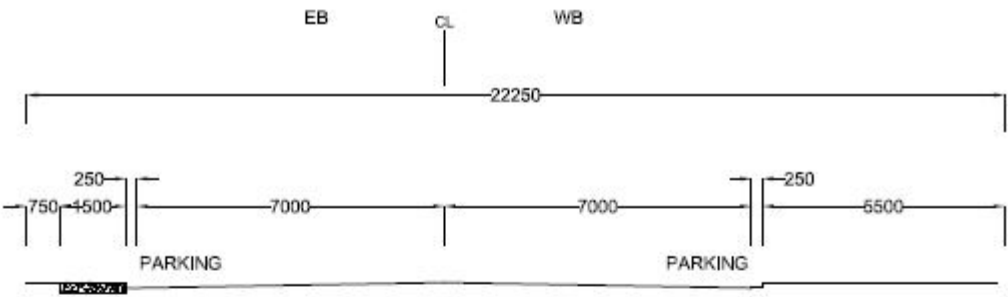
Proposed Section 4 – Hwy 7 West of 6th St. East
